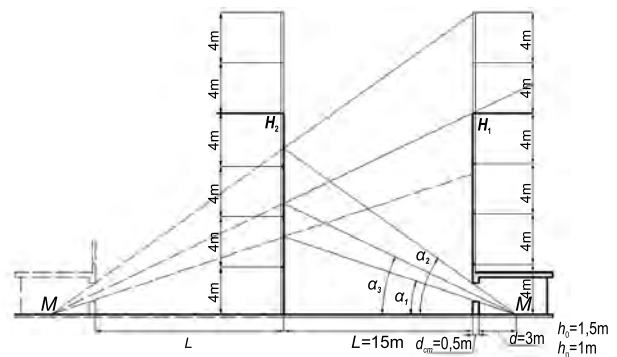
A diagram for accounting of an opposite building's specular facade (cases 1 and 2)
